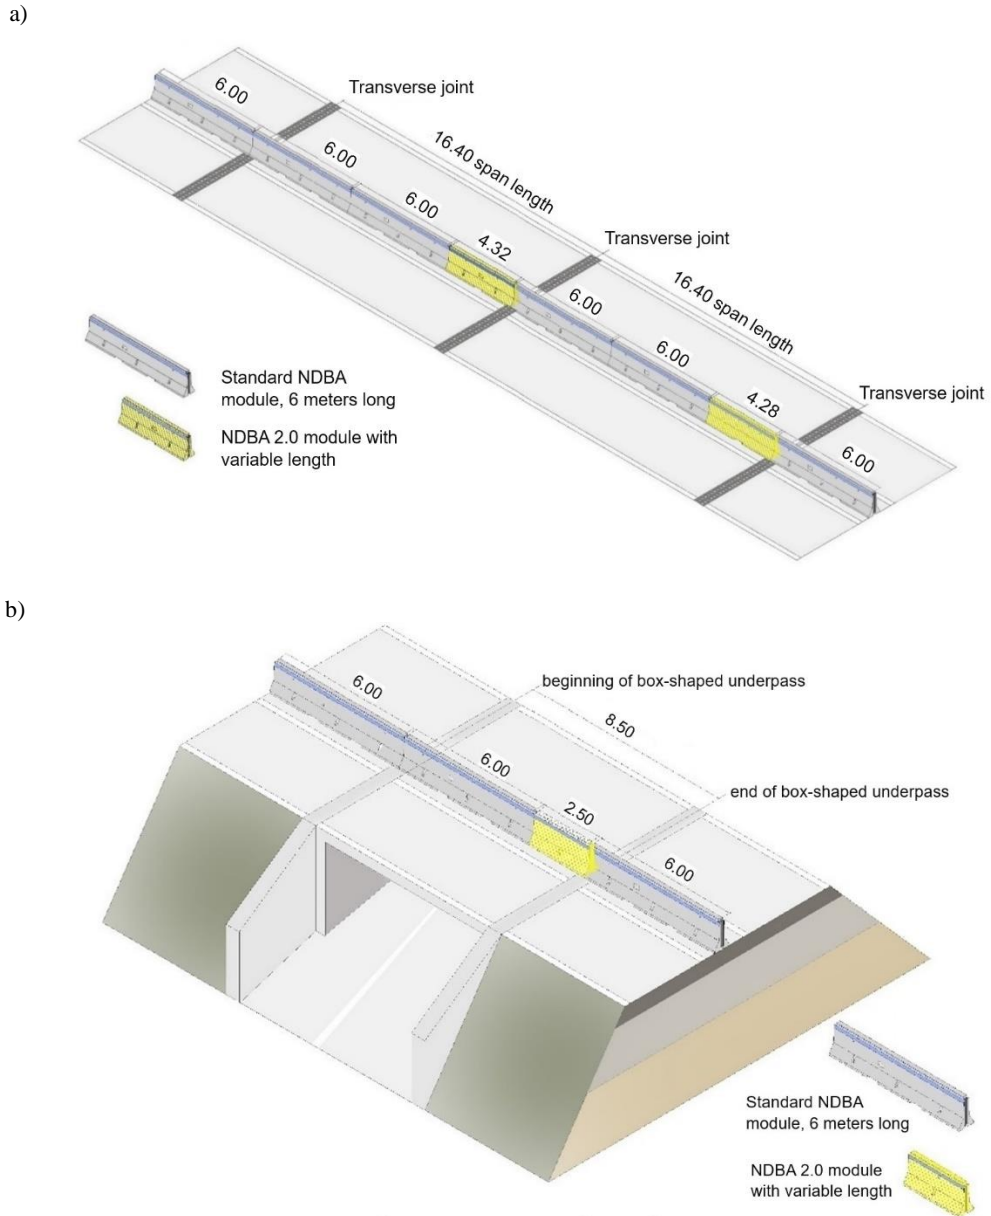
Typical installation on (a) bridges and viaducts with transverse joints; (b) crossing structures. Source: designs and photos are made by the Authors
